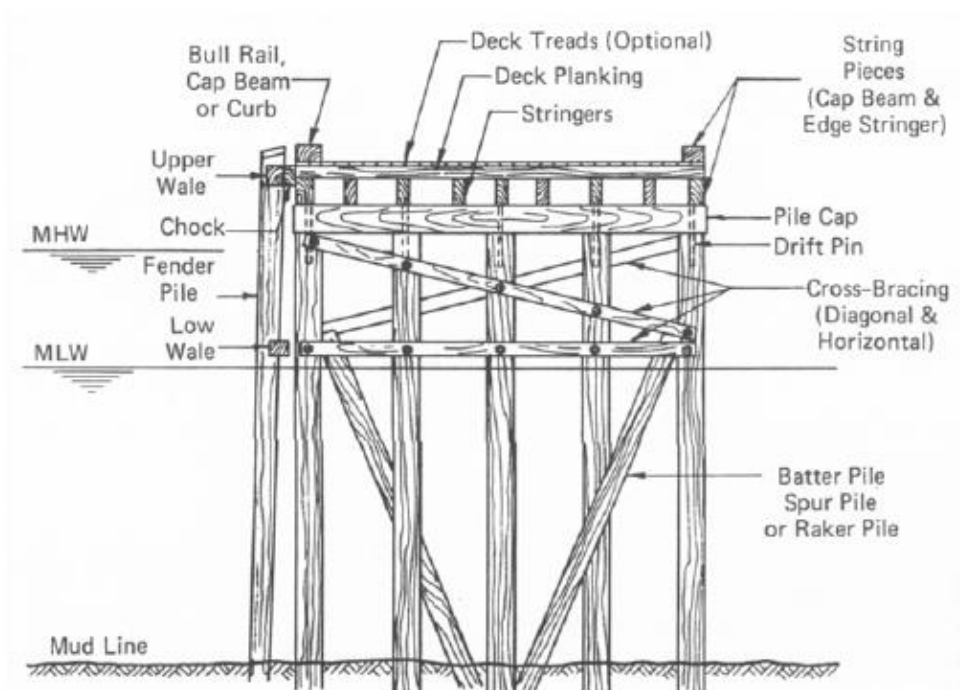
Typical timber pier nomenclature. (Gaythwaite, 2004: 240)
